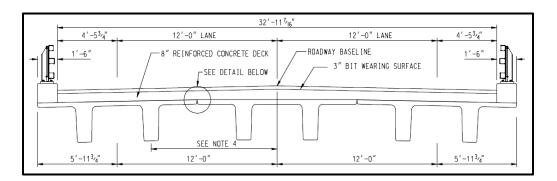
Cross Section of NEXT Beam Bridge with Partial-Depth Section
